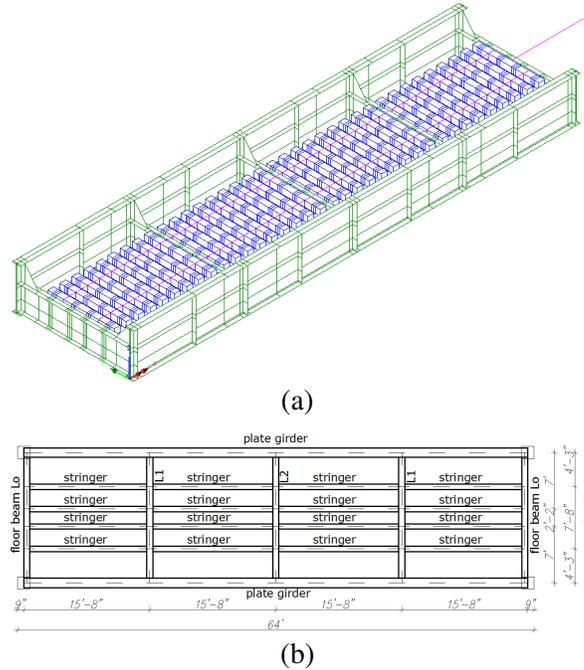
LUSAS TPG Model for floorbeam-stringer system (a) overall model, and (b) framing plan layout
